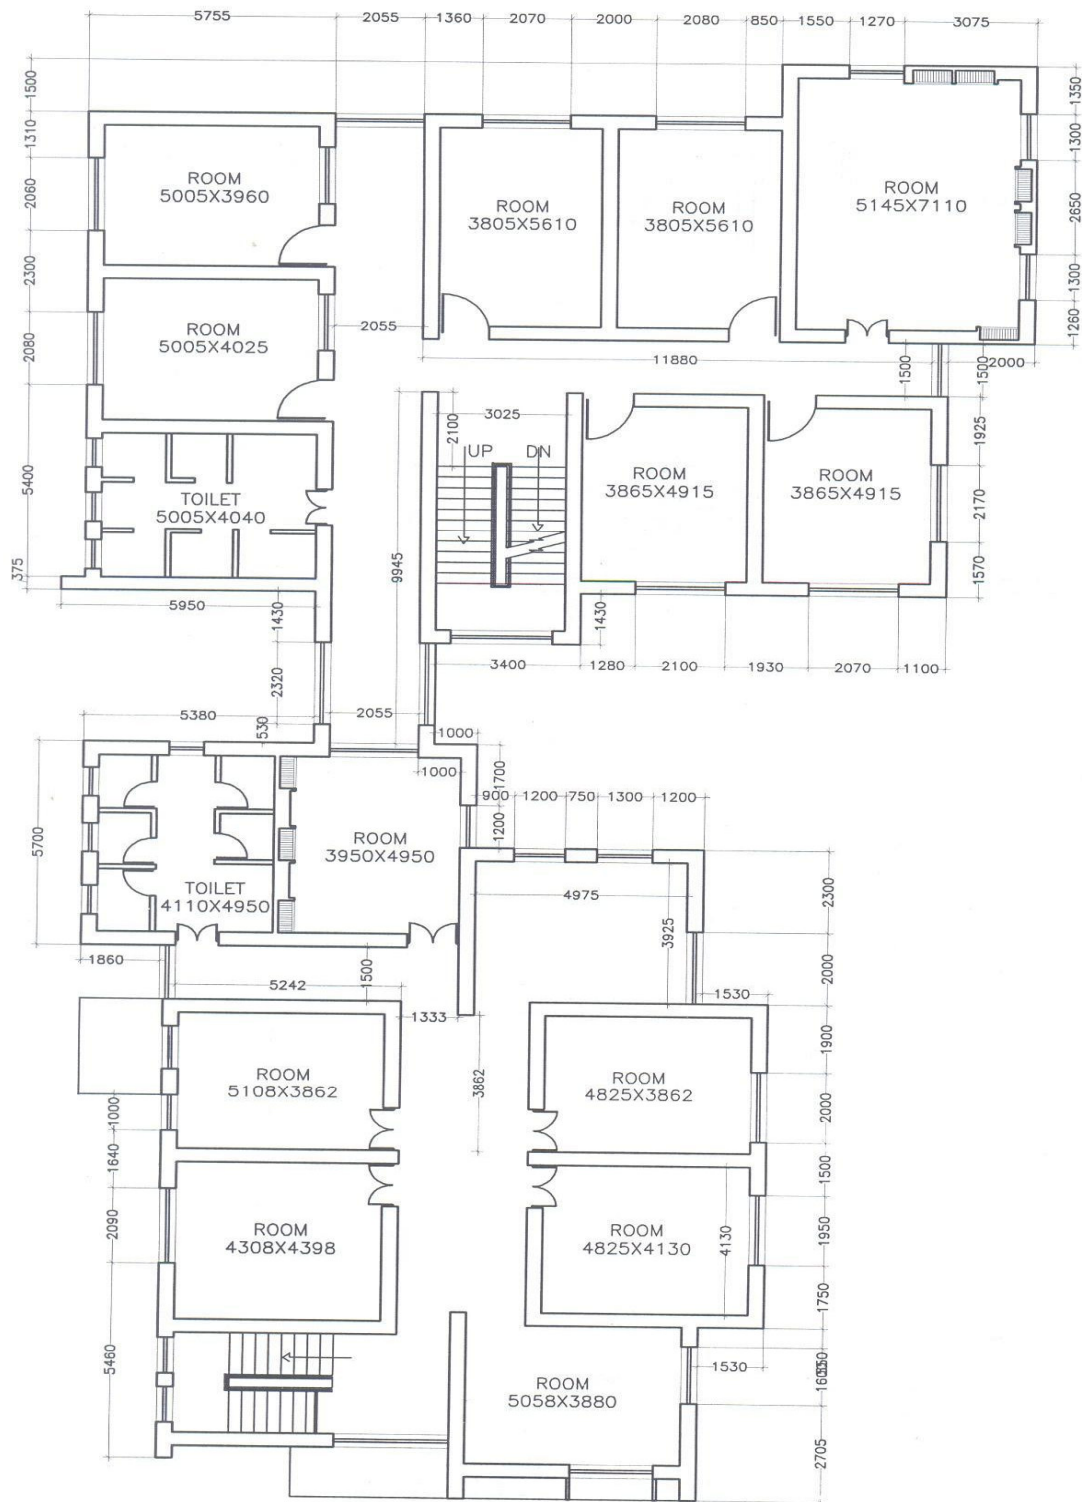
Autocad design of the First floor K M SHAW Hall of residence
